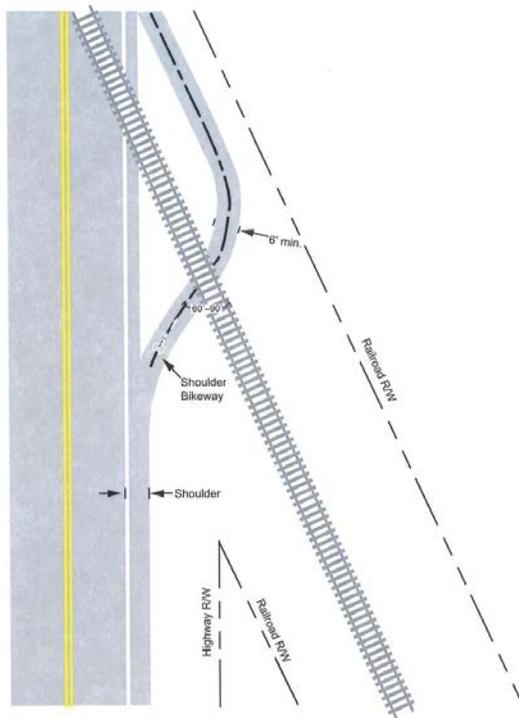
Correction for Skewed Railroad Grade Crossing—Separate Pathway
